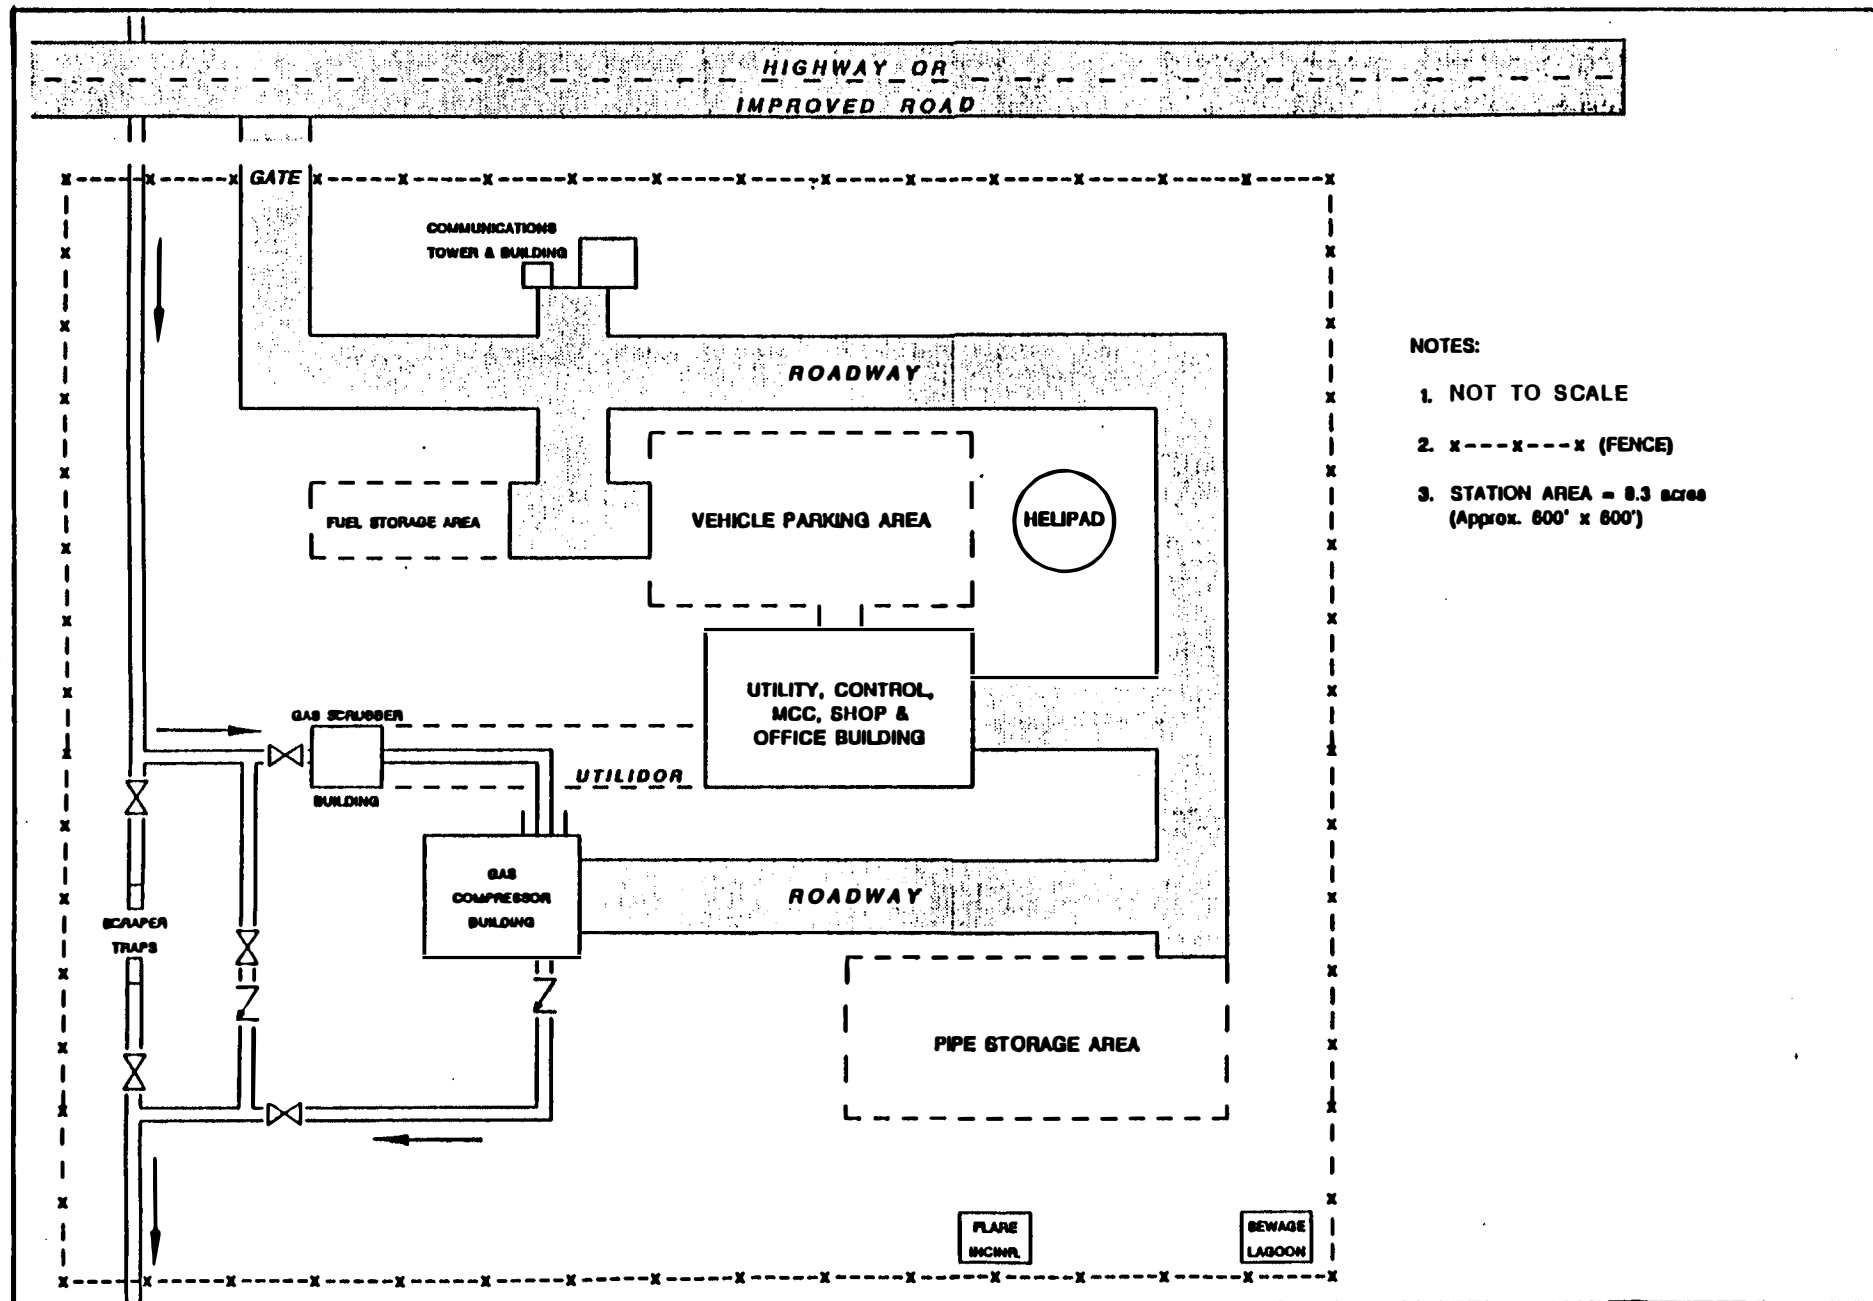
PROPOSED PLOT PLAN COMPRESSOR STATIONS NO. 2-6
